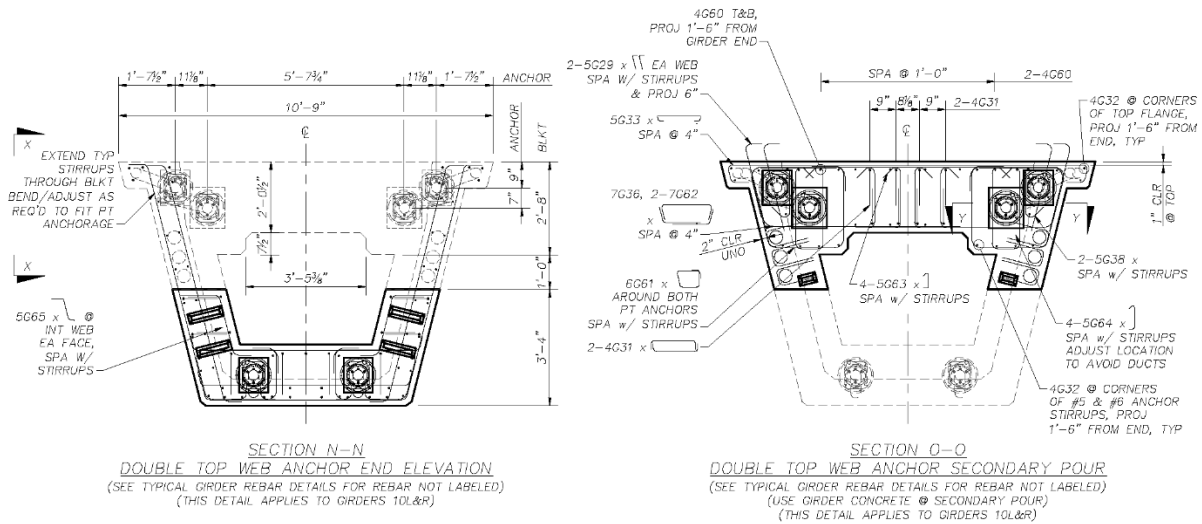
Blockout and Secondary Pour for PT Anchor Zone
